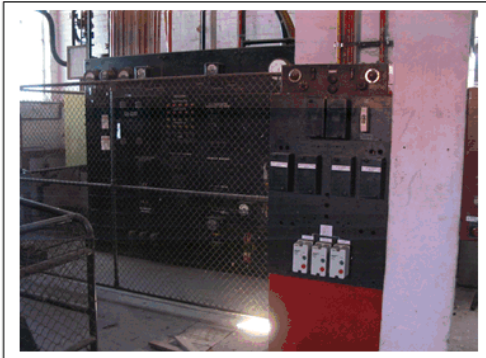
Cannery Switchroom - Asbestos Switchboard Panel
